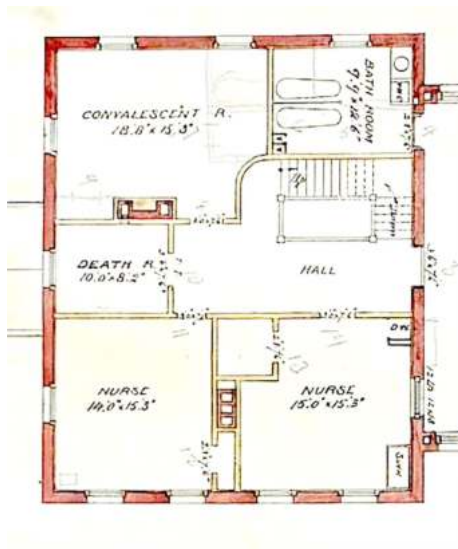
Sherborn Reformatory for Women, Framingham, Massachusetts. Plan of the death room near the exit. Architect: George Ropes, 1874. Drawing. ©Massachusetts State Archives
